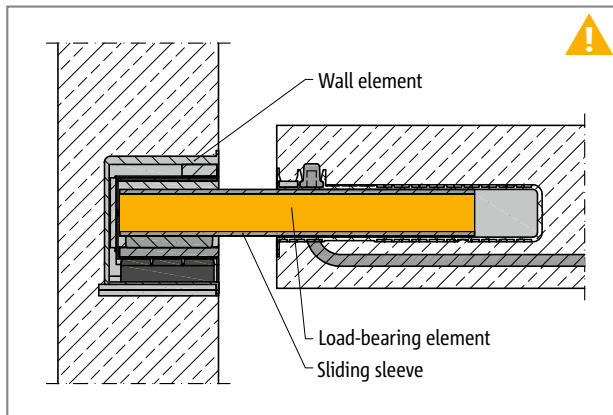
Schöck Tronsole® type Q: Multi-part product (wall component, load-bearing component, sliding sleeve); load-bearing element (yellow) must be installed on the building site.
